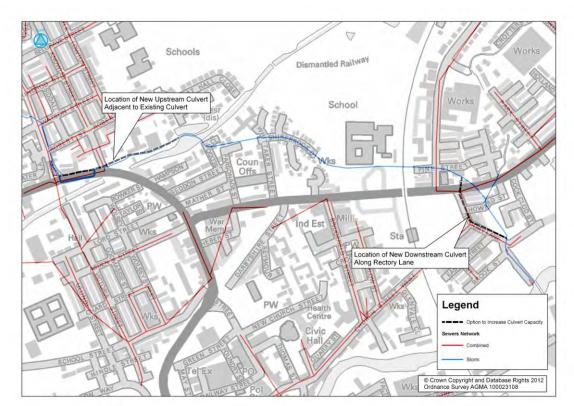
Locations of Capacity Improvements within the Stormwater Culvert
